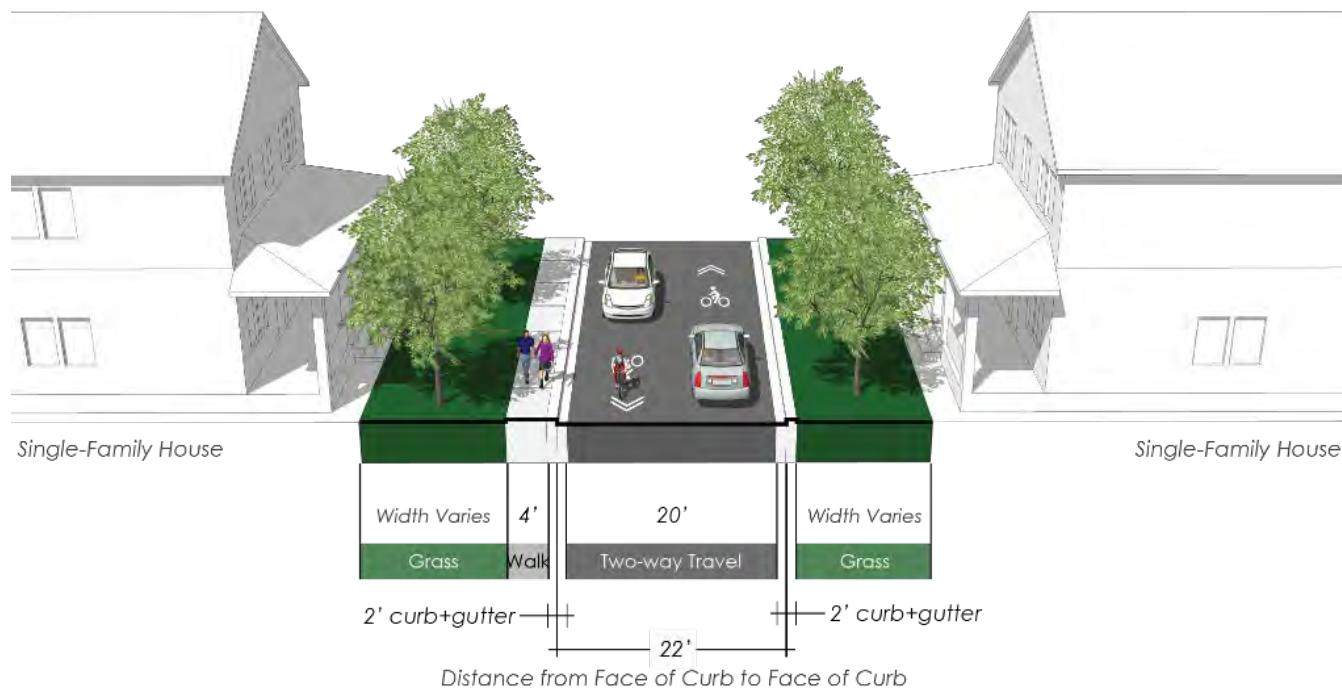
Sleaford Road – Tilbury Street to Pearl Street (Looking East)
